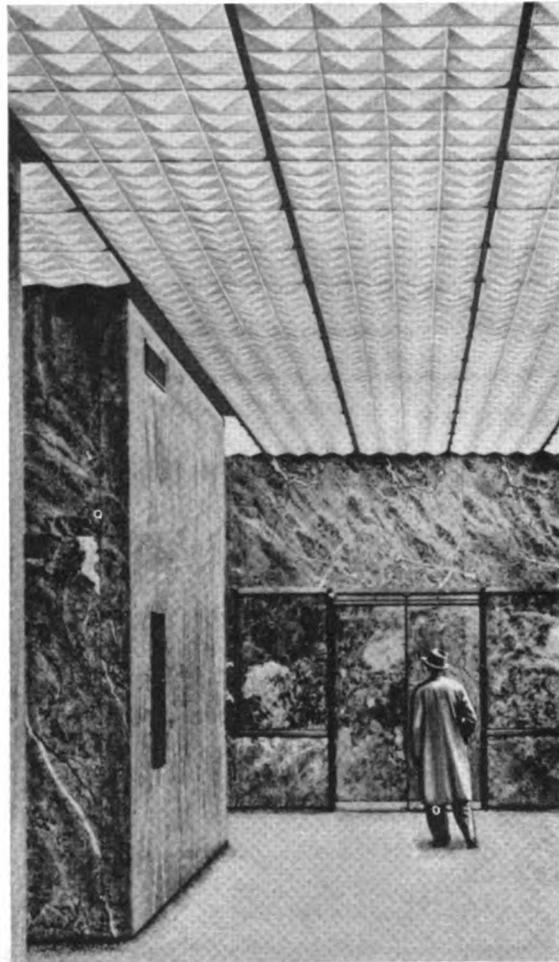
Example of design possibilities with Plexiglas acrylic plastic for ceilings.
